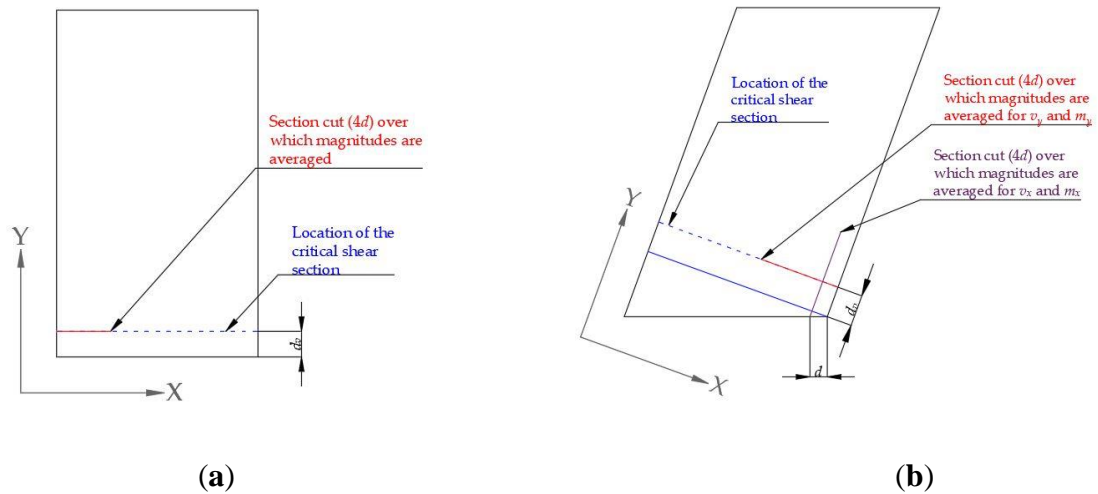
Shear section cuts for design. (a) Straight bridges; (b) Skewed bridges.
